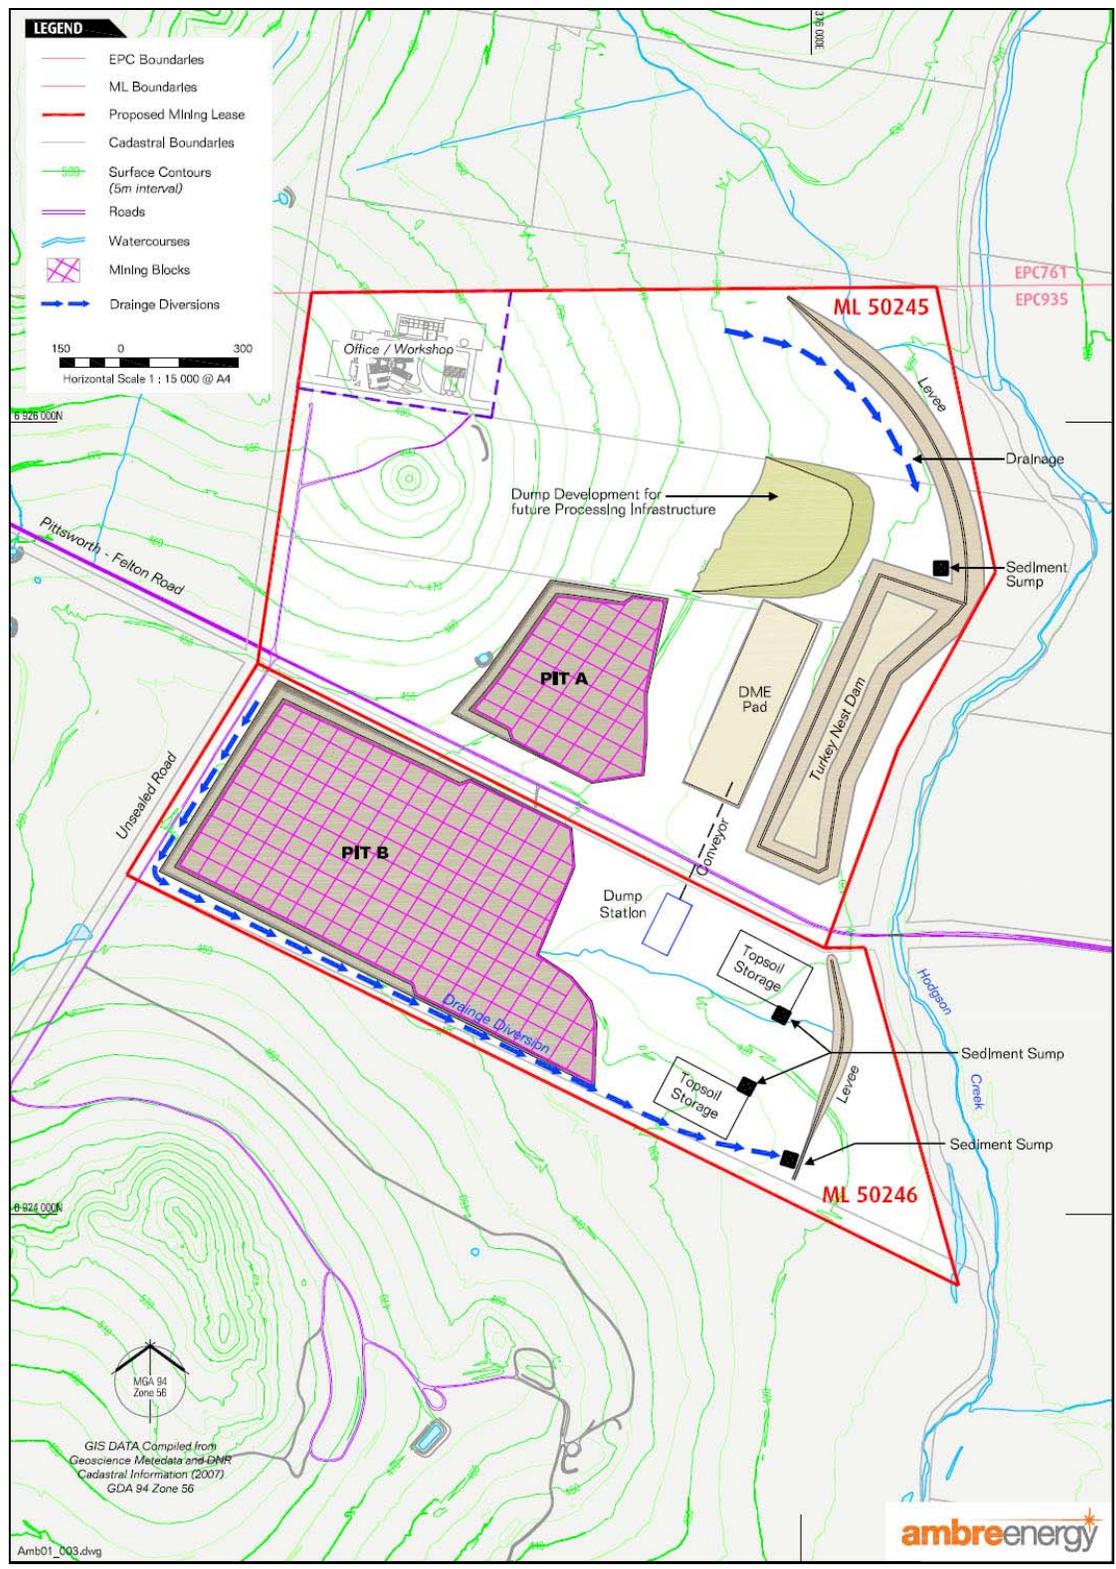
, Demonstration Stage Mine and Infrastructure layout plan
